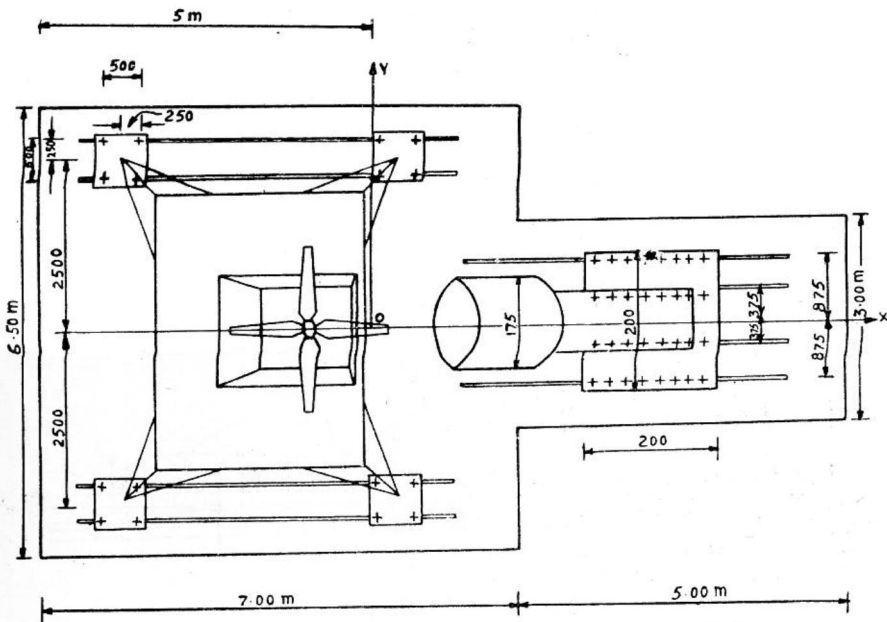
Plan showing placement of engine on to the Foundation.
